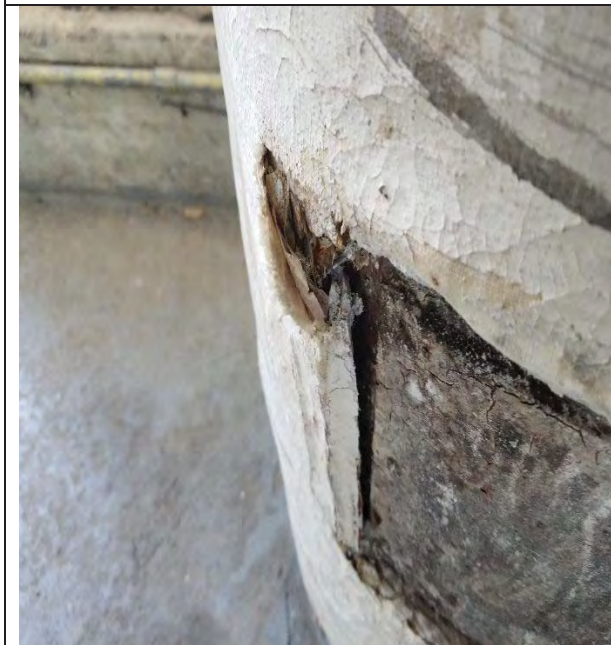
Parged pipe wrapping located in Penthouse 222. Presumed asbestos containing.
